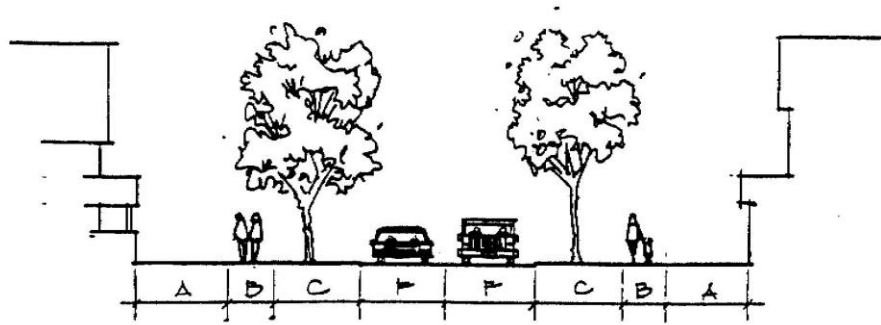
Schematic sketch of a typical local street cross-section. Table 1 lists the recommended dimensions of each component: A) building setback from street right-of-way; B) walkway; C) planting area; F) travel lane.
